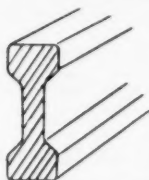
Cross section through an iron cast-iron beam designed to resist a bending moment.
